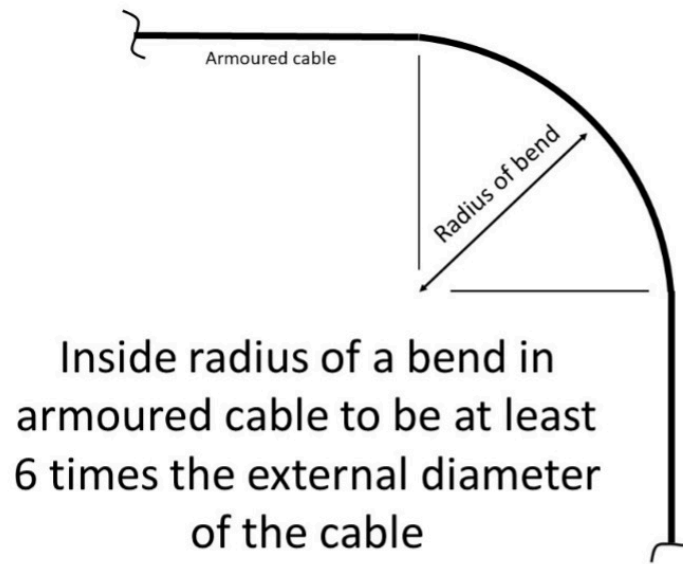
Inside radius of a bend in armoured cable to be at least 6 times the external diameter of the cable
